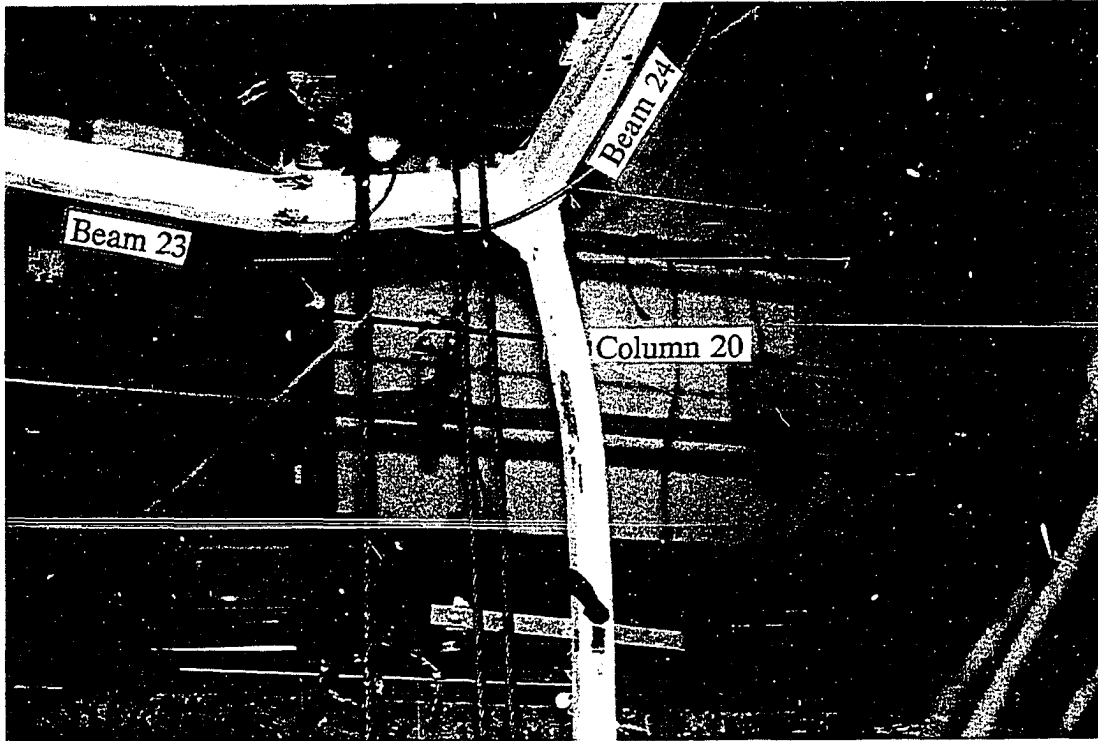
Plastification of Beam 23, Beam 24, and Column 20
